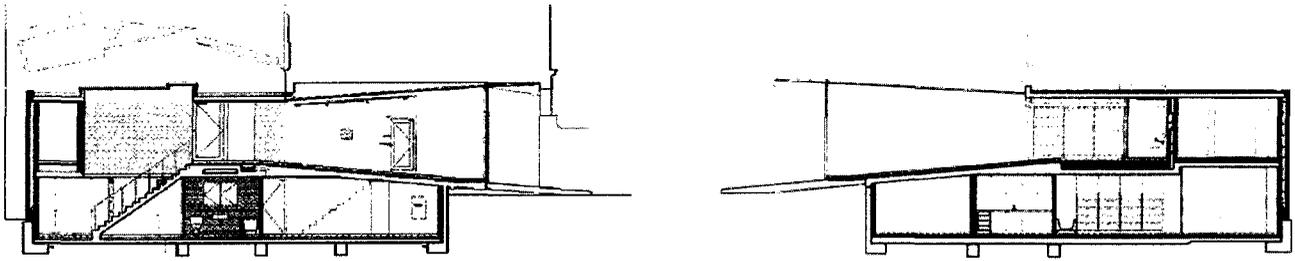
Sections through entrance ramp, looking in both directions. Caruso St John. (source: *As Built: Caruso St John Architects*)
